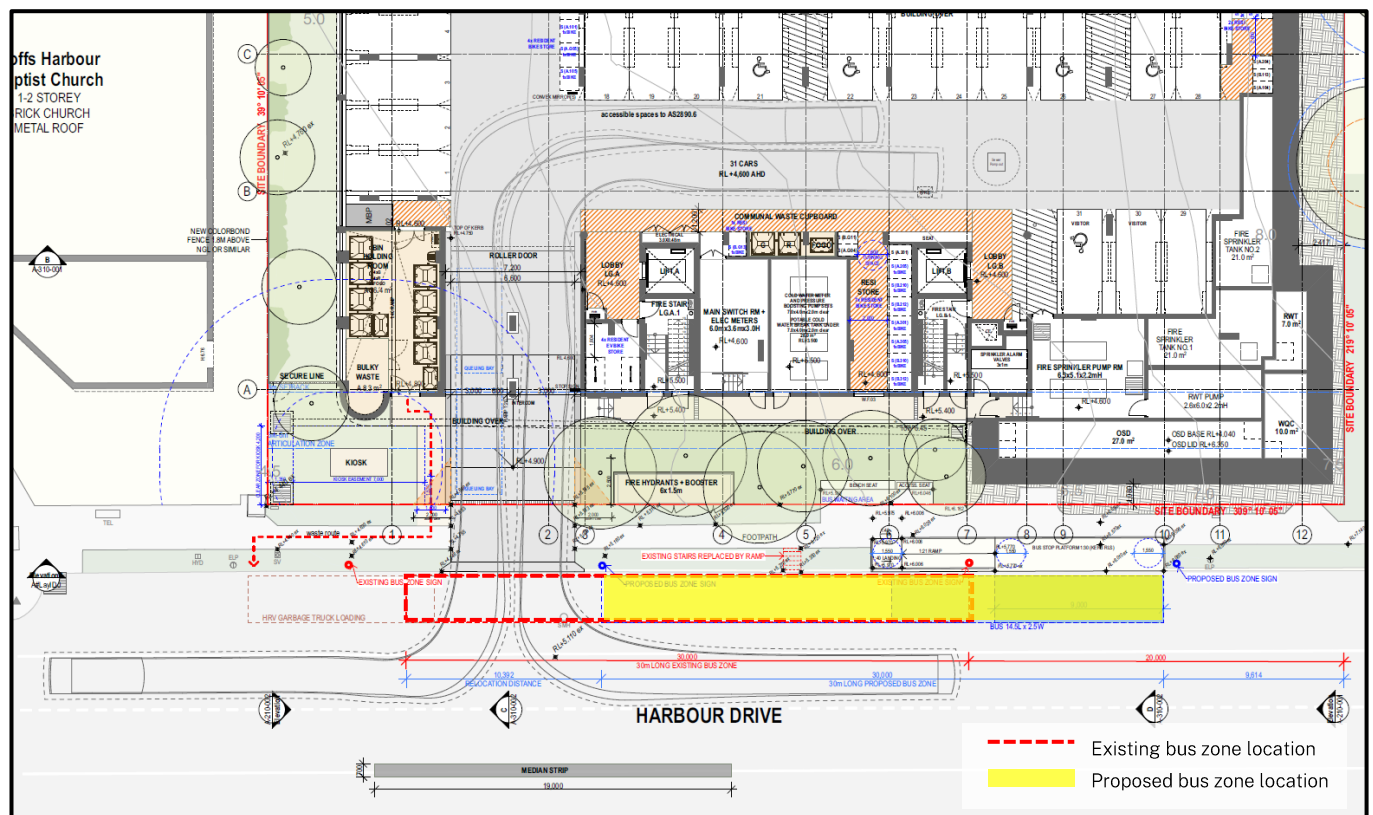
| Vehicle access and bus stop arrangement (source: Applicant RtS – Revised Architectural Plans)
